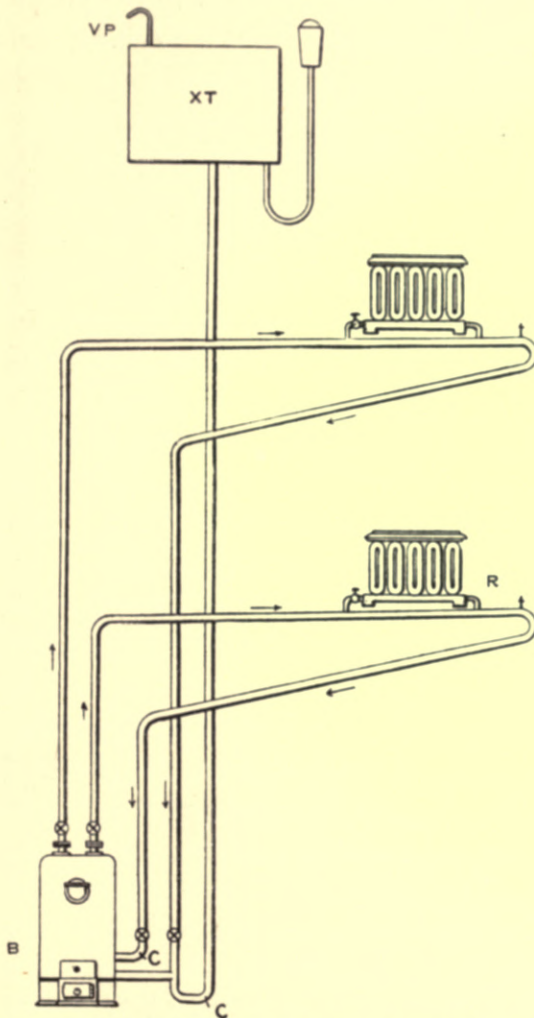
Elevation of Low-pressure Hot-water Apparatus, with Separate Circuit for Each Floor.
